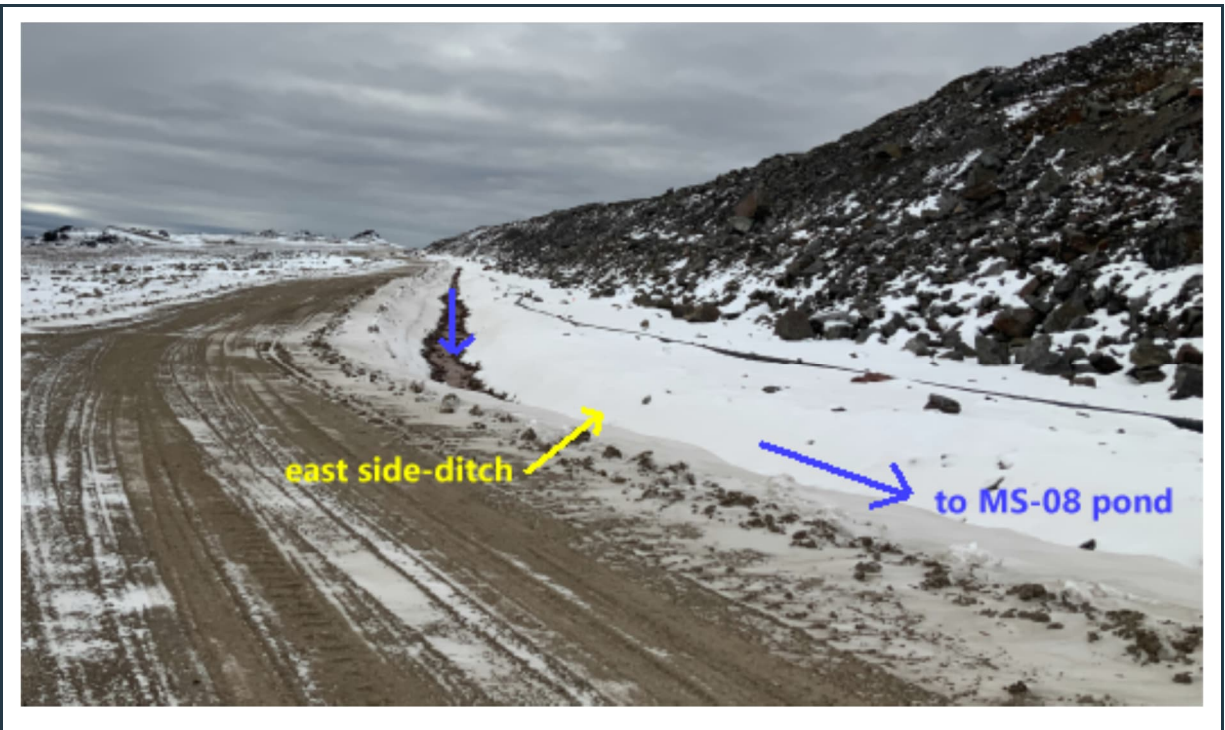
View of the well-maintained drainage ditch around the east side of the waste rock facility, leading to the MS-08 pond. There was already some snow in the ditch in September.
